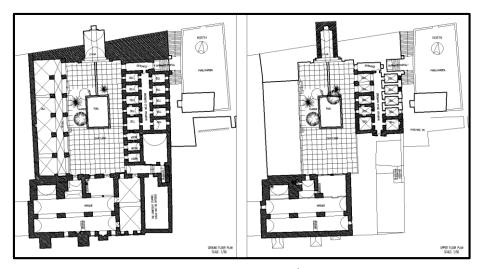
Şehidiye Madrasah Floor Plans (İbrahim Duyan Archive)
